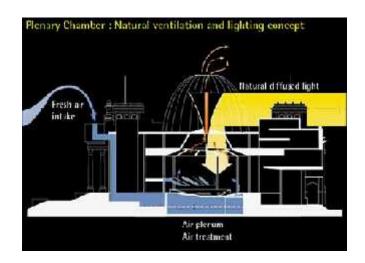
Natural ventilation and lighting concept the Berlin Parliament House
